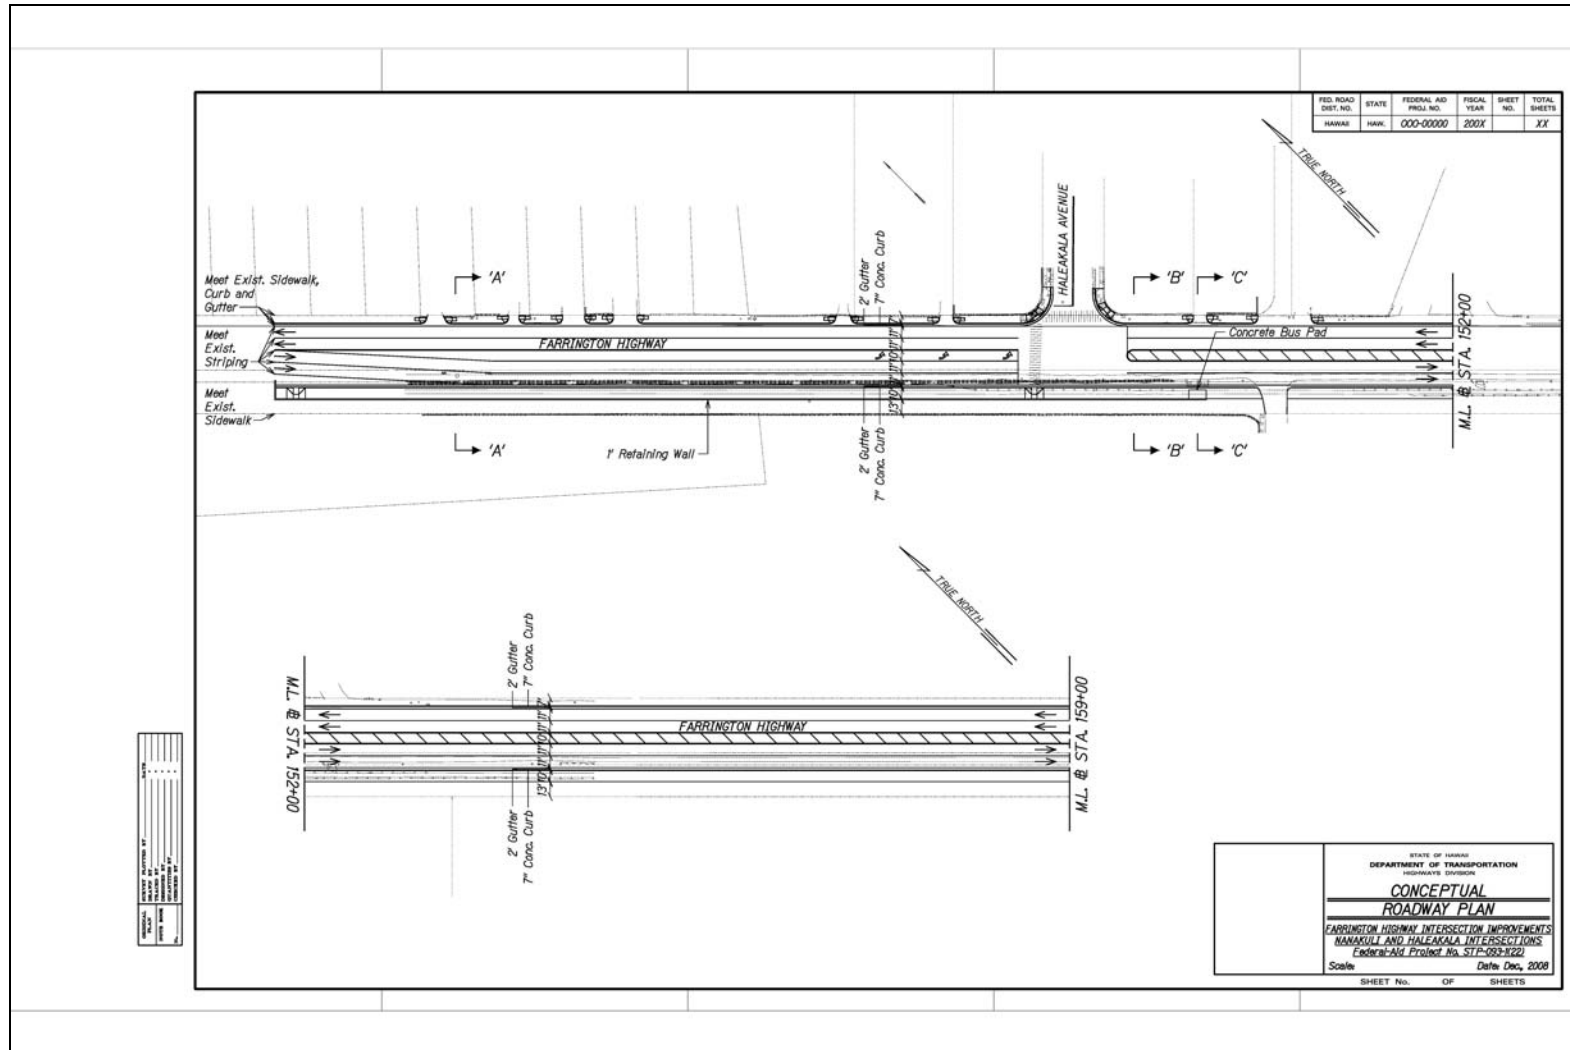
Conceptual Roadway Plan, north portion, showing vicinity of Farrington Highway and Helelua Street (HDOT 2008)
